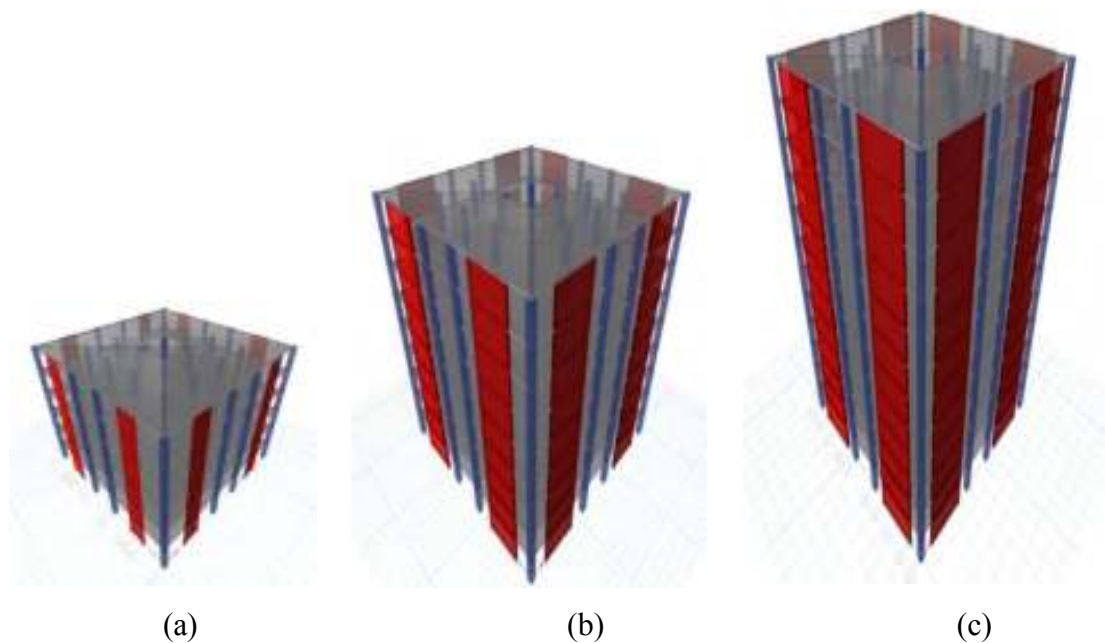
Sample ETABS 3D Analysis Models: (a) 6-Story Buildings, (b) 9-Story Buildings, (c) 12-Story Buildings
